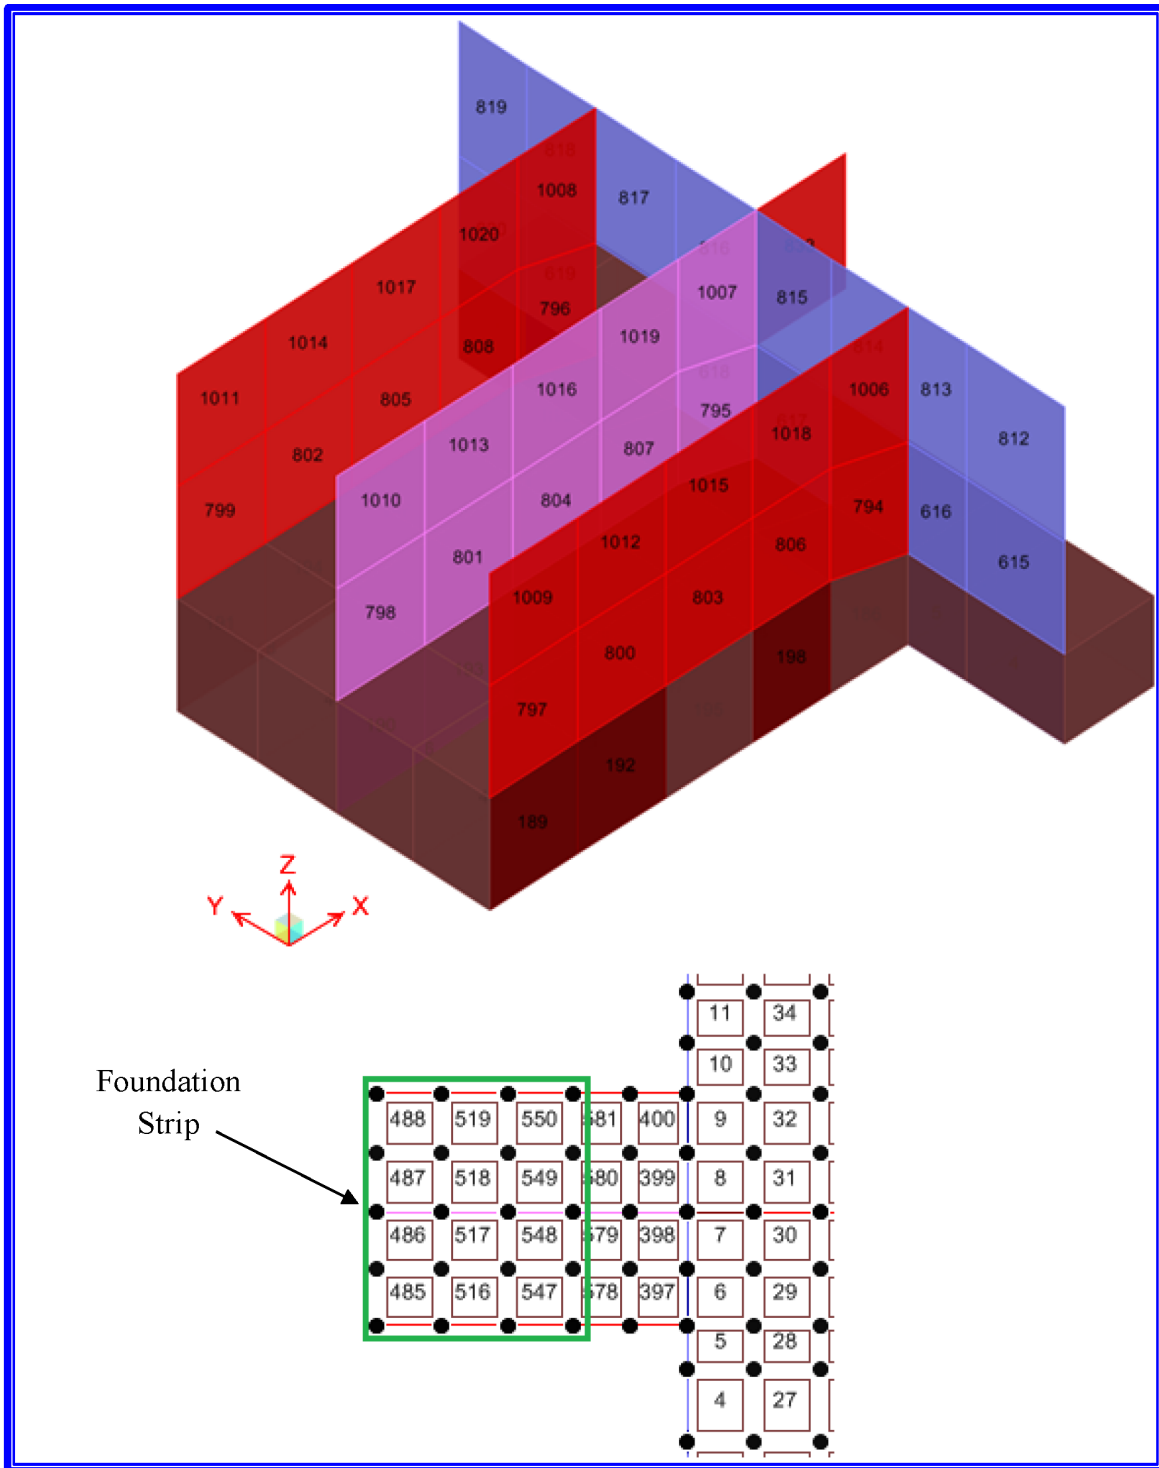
Partial Tunnel Showing Foundation and Walls
